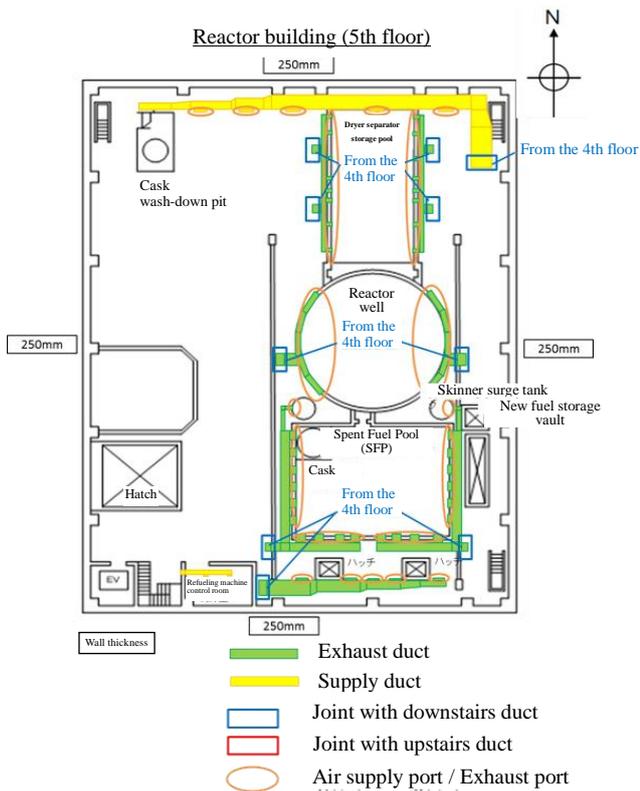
Supply and Exhaust Duct Layout Plan (5th floor)
